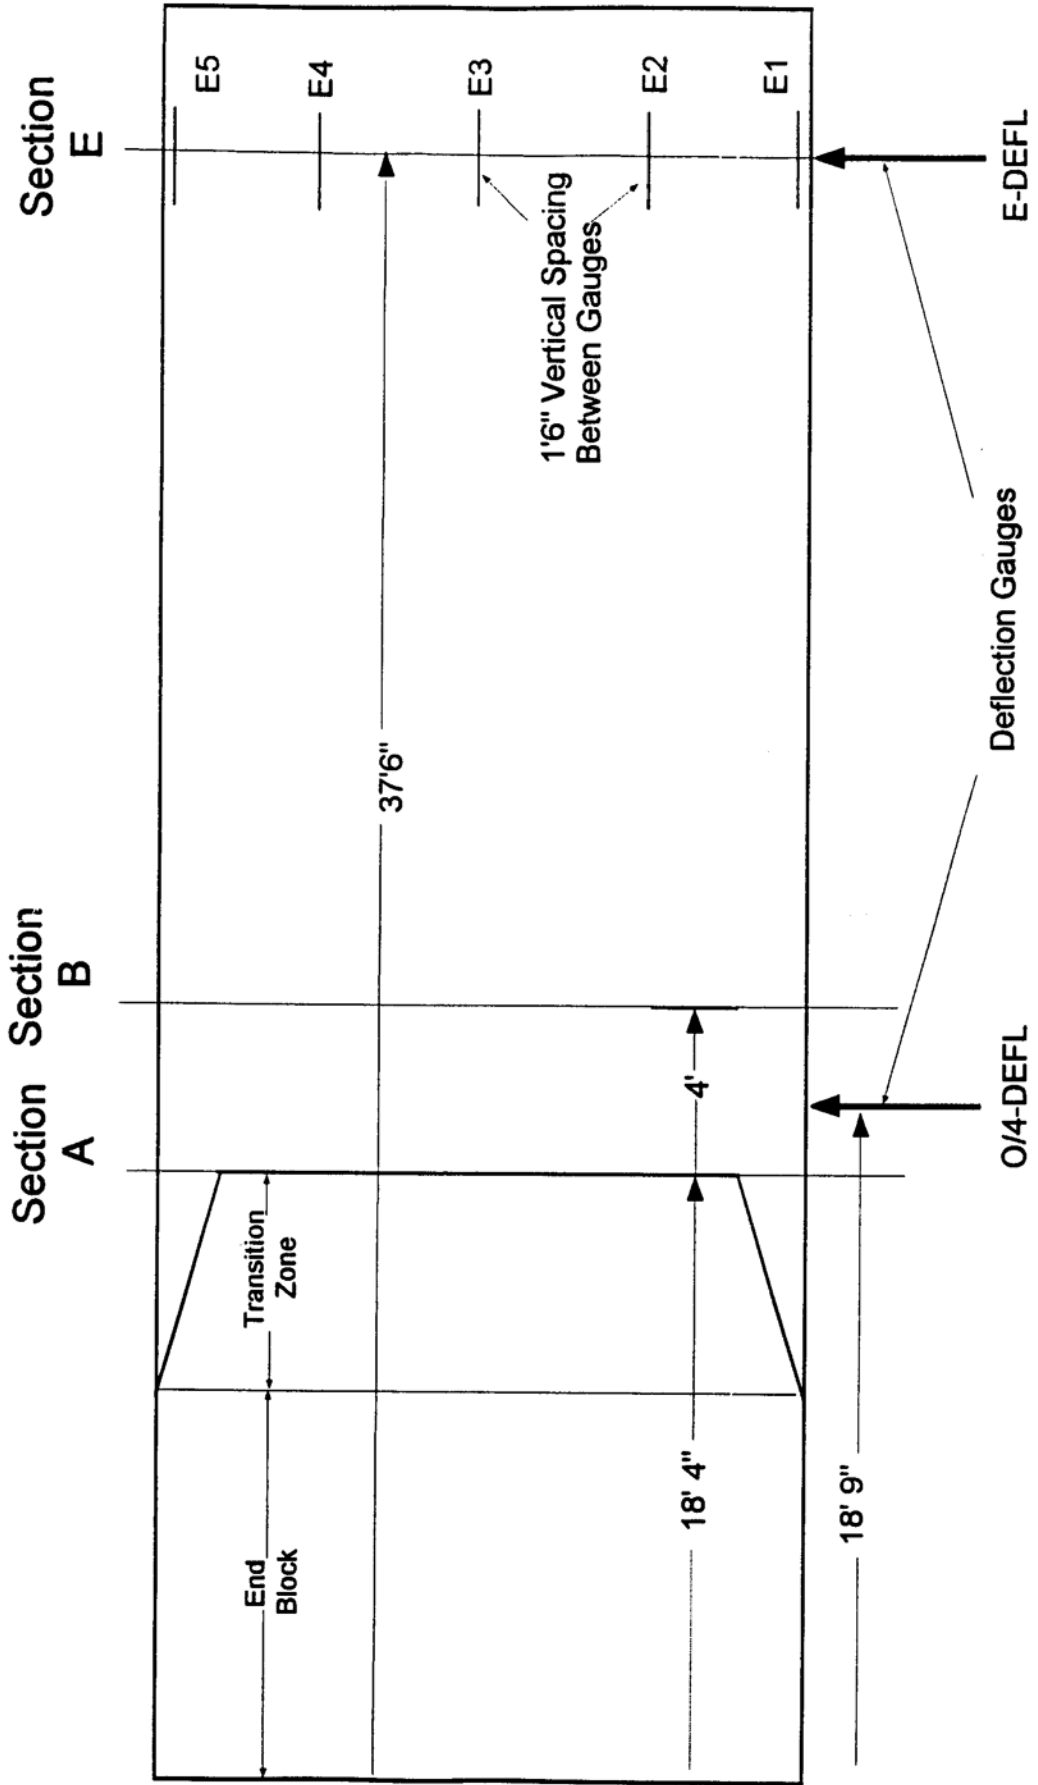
Location of Instrumented Sections on Girder with Oval Ducts
